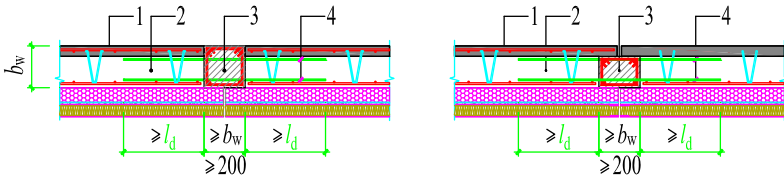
Vertically connected steel bar overlapping construction at the horizontal joints of the single-sided composite shear wall
